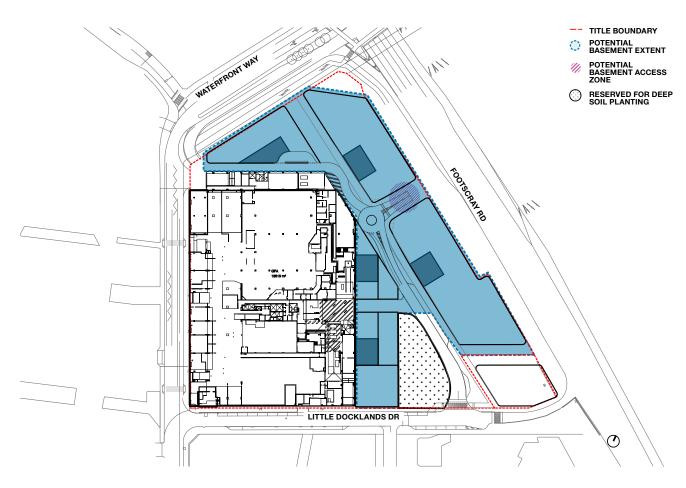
Movement and Parking Plan 5 - Possible basement extent
